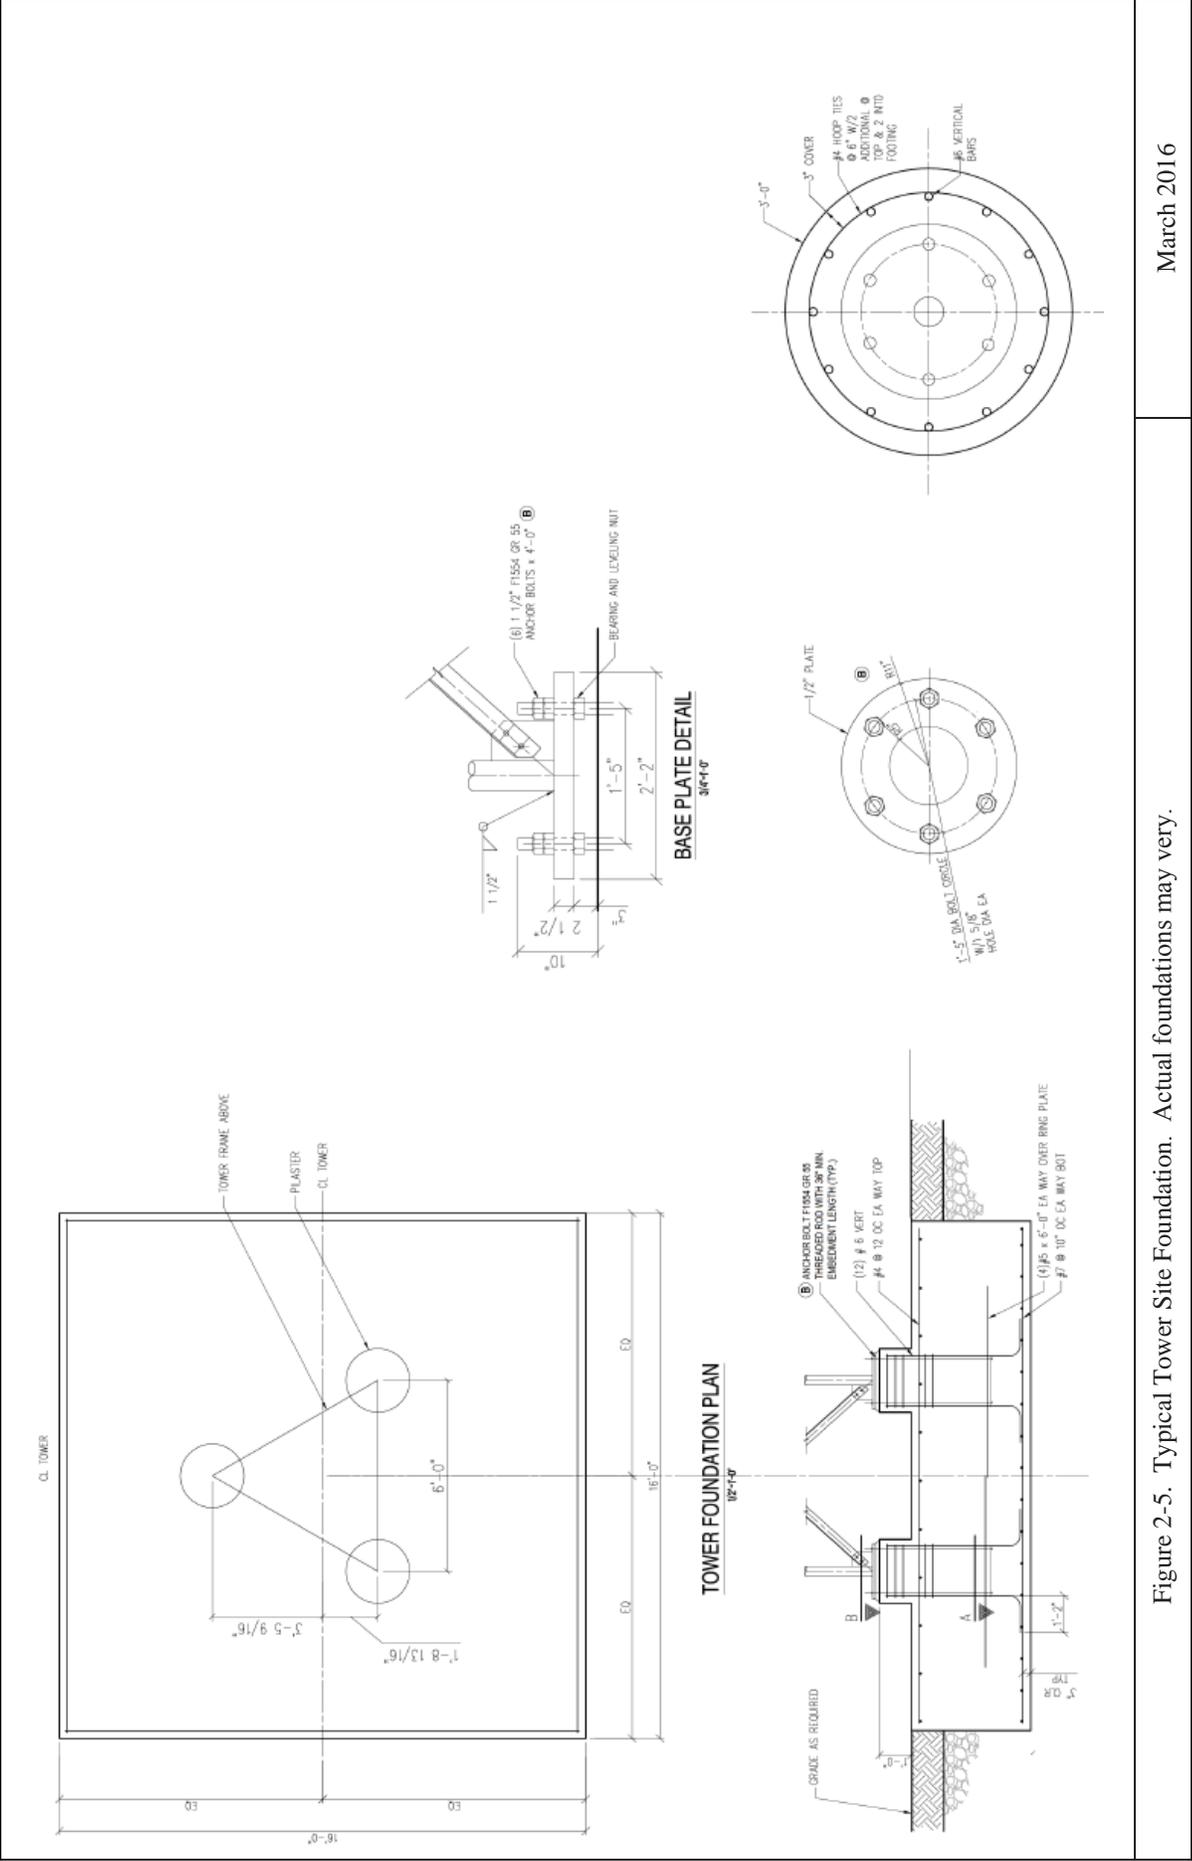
Typical Tower Site Foundation. Actual foundations may vary.
